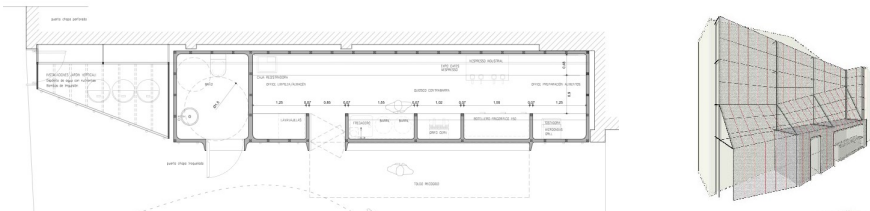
Floor plan and structural volumetry (WOHArchitecture 2014)
